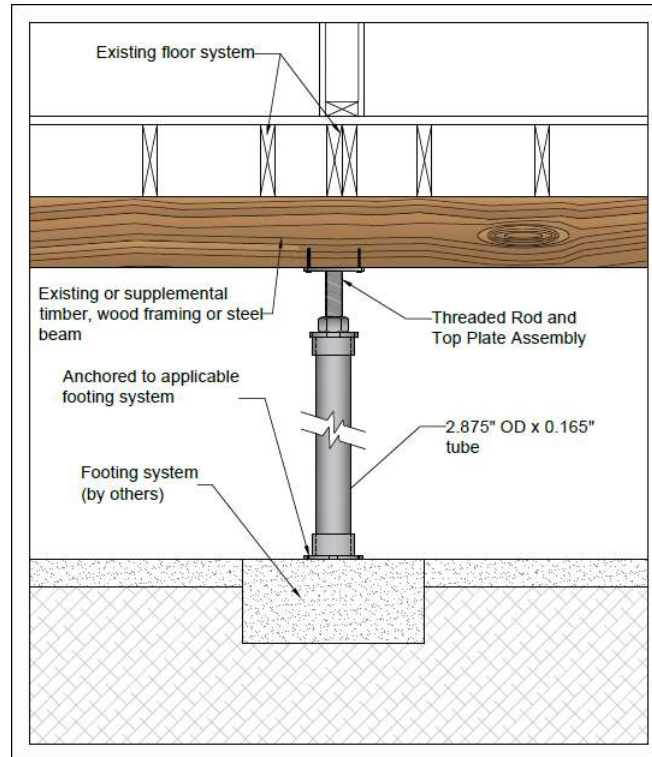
THREADED ROD AND TOP PLATE ASSEMBLY
